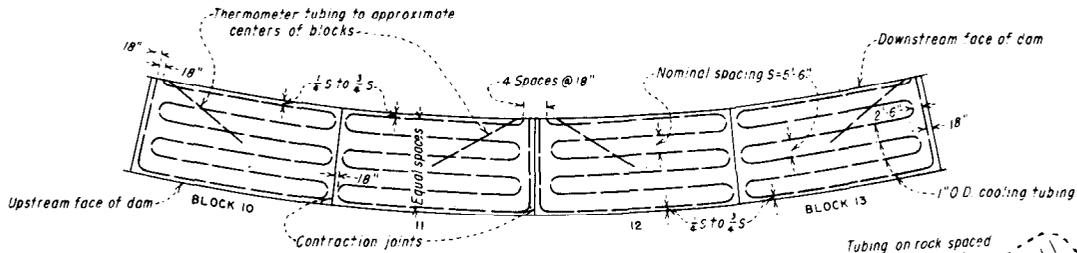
Glen Canyon Dam—concrete cooling details.
